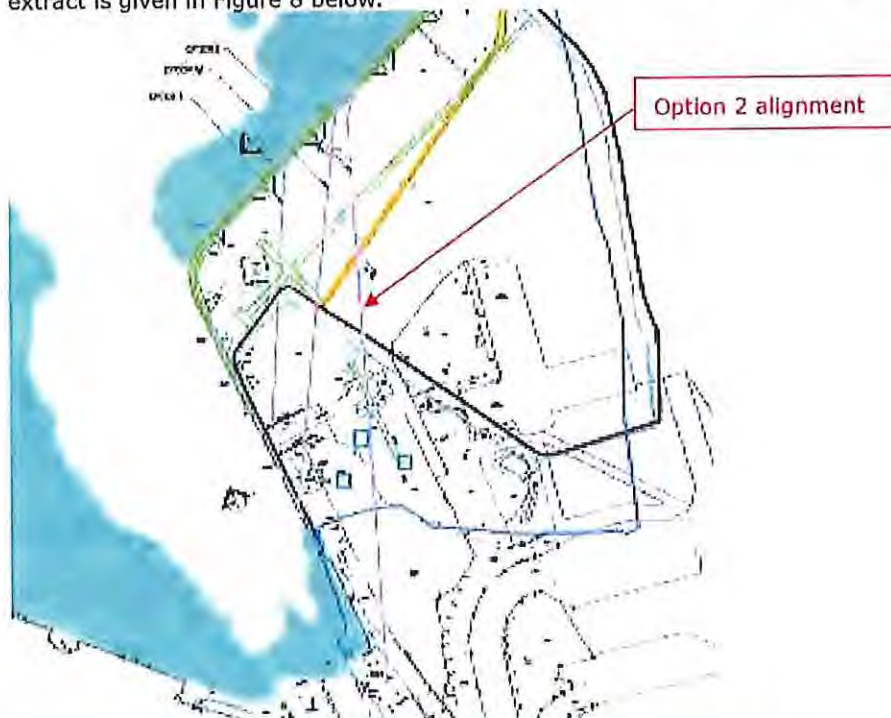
Extract from buried structure plan – refer to Appendix 2 for full detail
